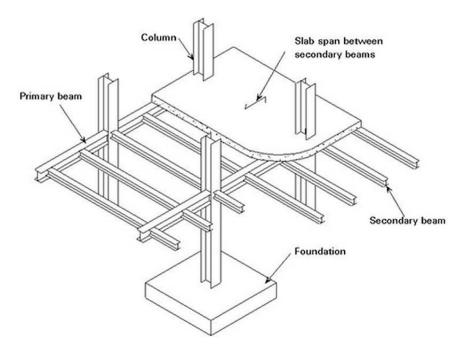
The principal element of a typical multi-story building (Zalka, 2012)
